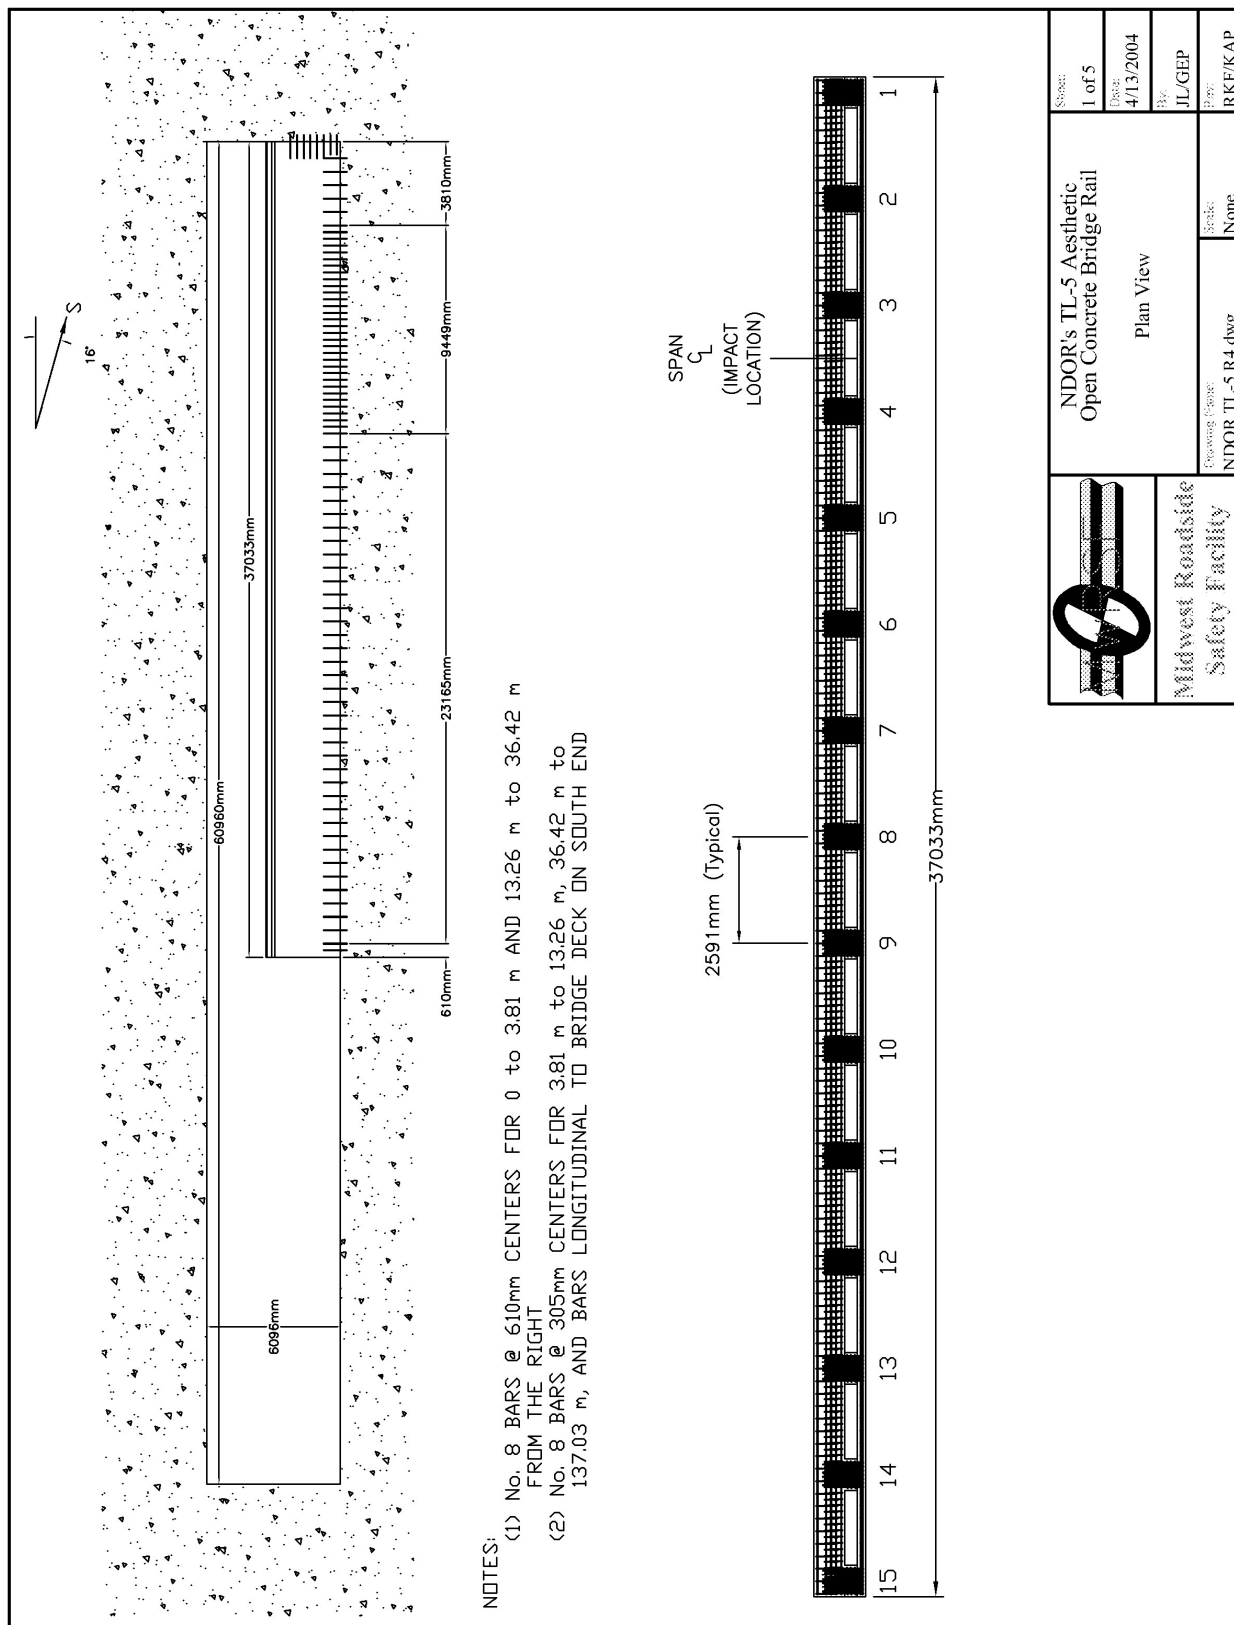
Layout for NDOR's TL-5 Aesthetic Open Concrete Bridge Rail
